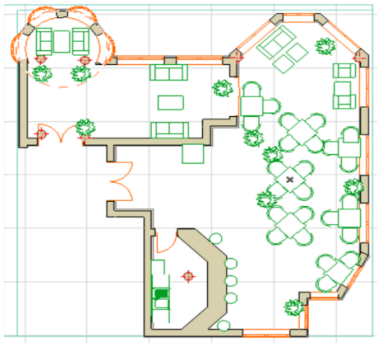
Existing floor plan at Stardom Hotel bar lounge and VIP lounge showing barriers between seating arrangements, small bar with a pillar in the middle and the large windows that provide enough natural light. (Author, 2020)
